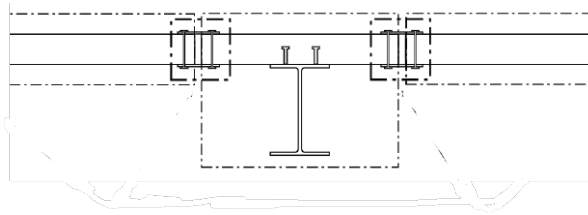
Demountable slab to slab connection (Brouwer, 2025)
